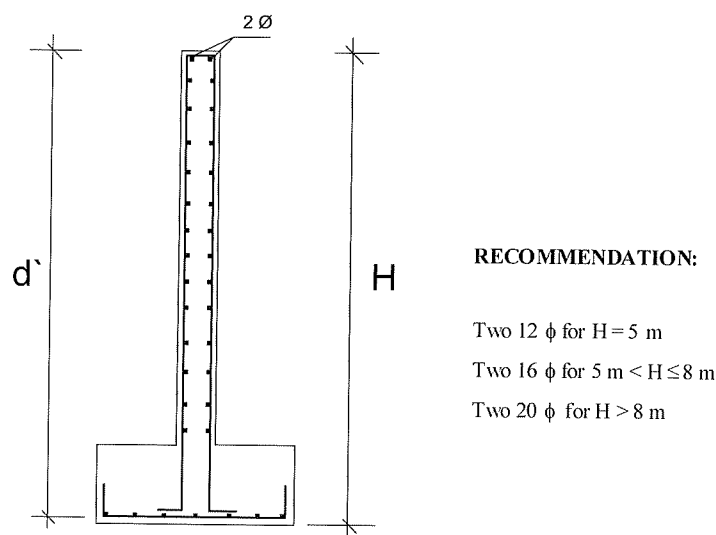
Recommendation for reinforcement at the top of the wall. (Taken from J. Calavera, *Cálculo de Estructuras de Cimentación*, 4th edition)
